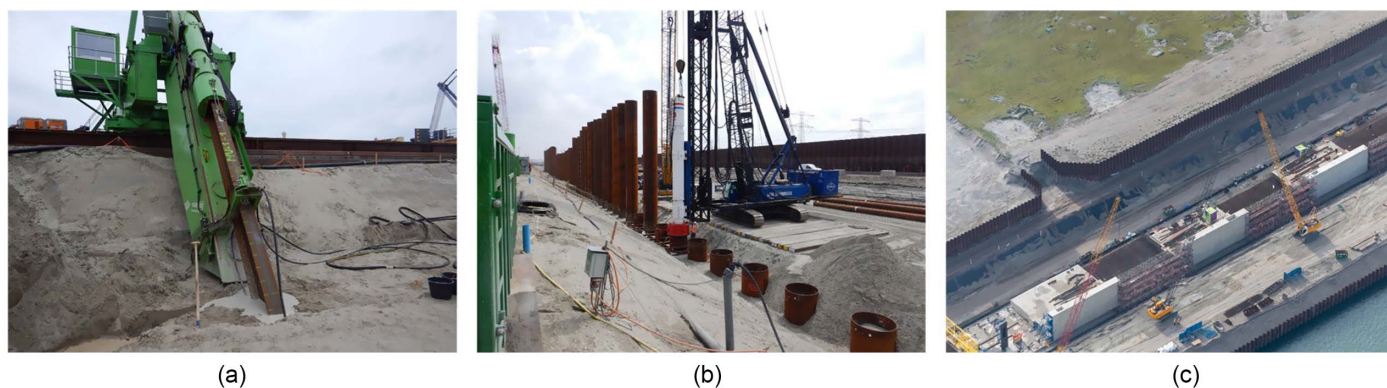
Construction sequence of the quay wall: (a) installation of the MV piles; (b) installation of the combined wall; and (c) construction of the relieving platform. (Images courtesy of Port of Rotterdam Authority.)
